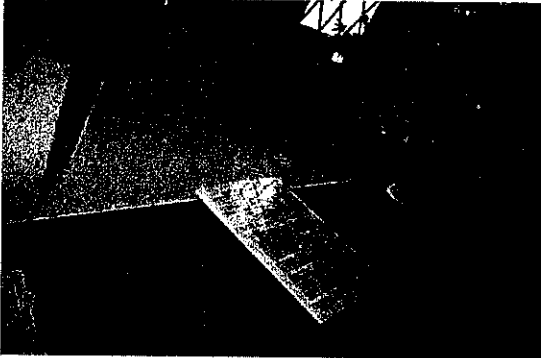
Interior, Space 2. Detail of sill of window 8. Note the cracking along the sill.
